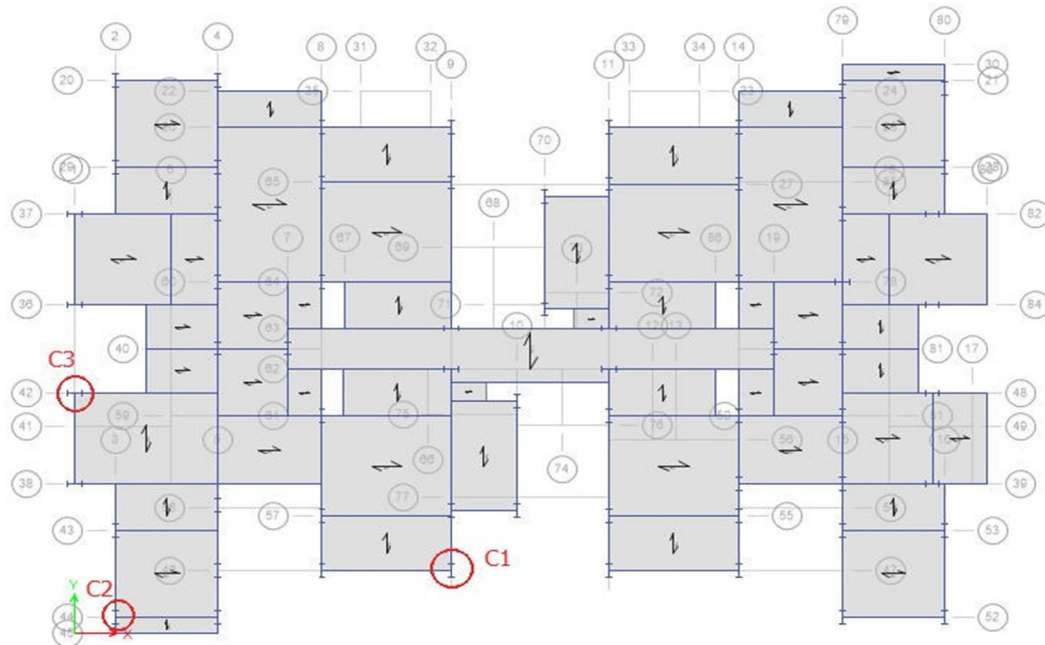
Columns under Fire loading at ground floor as per GSA specifications
